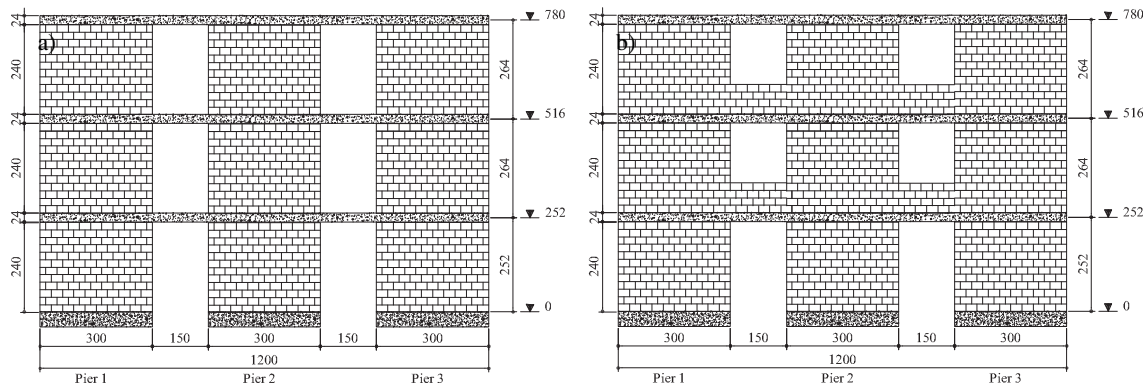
A modern URM building with spandrels consisting of a RC beam alone (a) and with composite spandrels (b).
